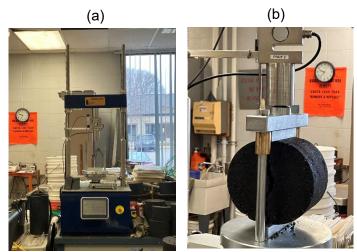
The IDT machine purchased for measuring the TSR: (a) test setup (b) specimen after testing.
